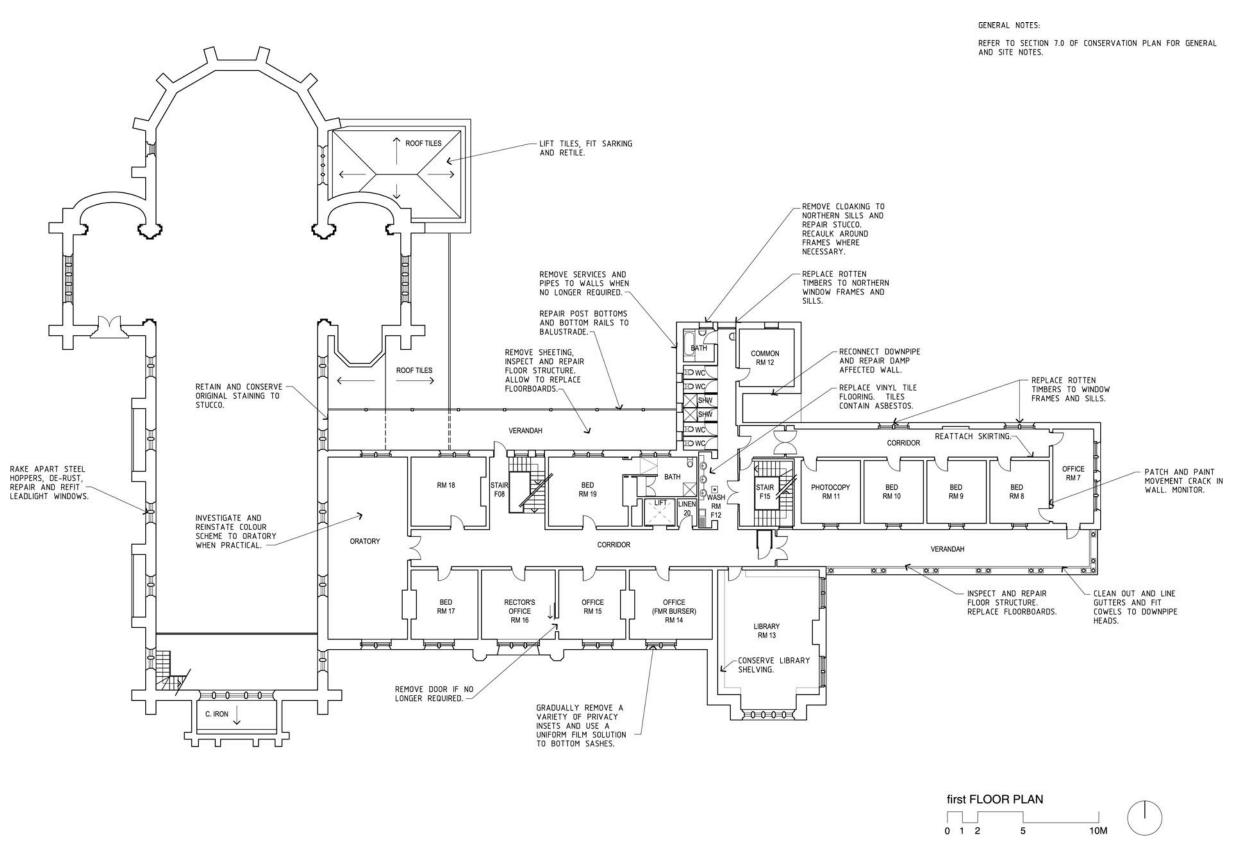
Recommended conservation works, first floor plan. Plan is for diagrammatic purposes only. *Philip Griffiths Architects August 2010.
